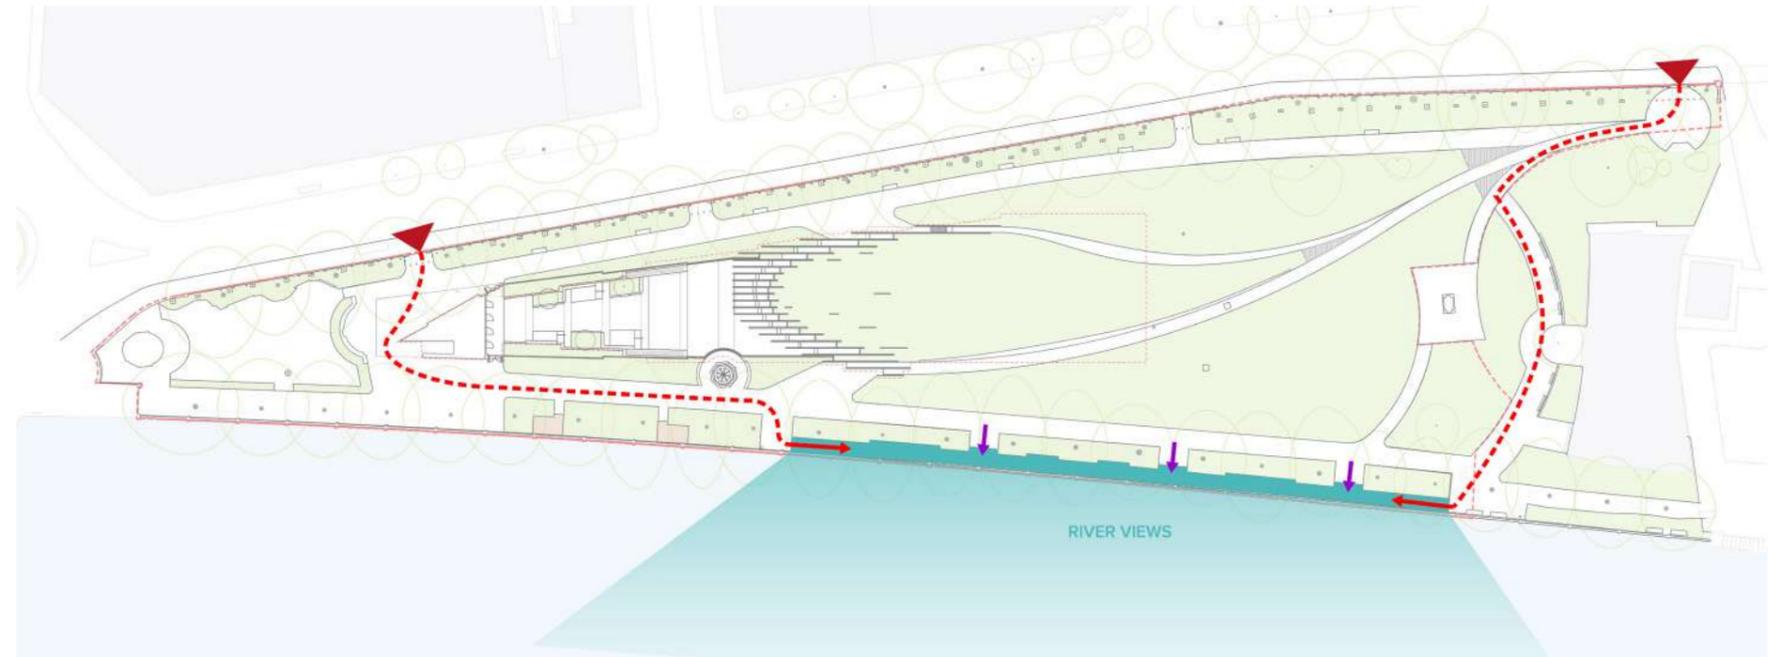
PROPOSED PLAN OF CLEAR VIEW TO RIVER THAMES FROM BOARDWALK
